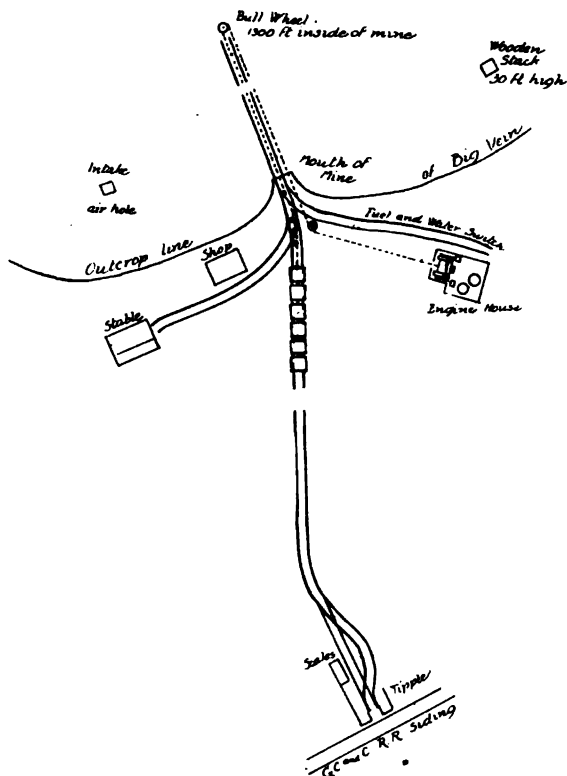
Sketch showing Plan of Haulage System, Shamrock Mine, Lonaconing Coal Company.
